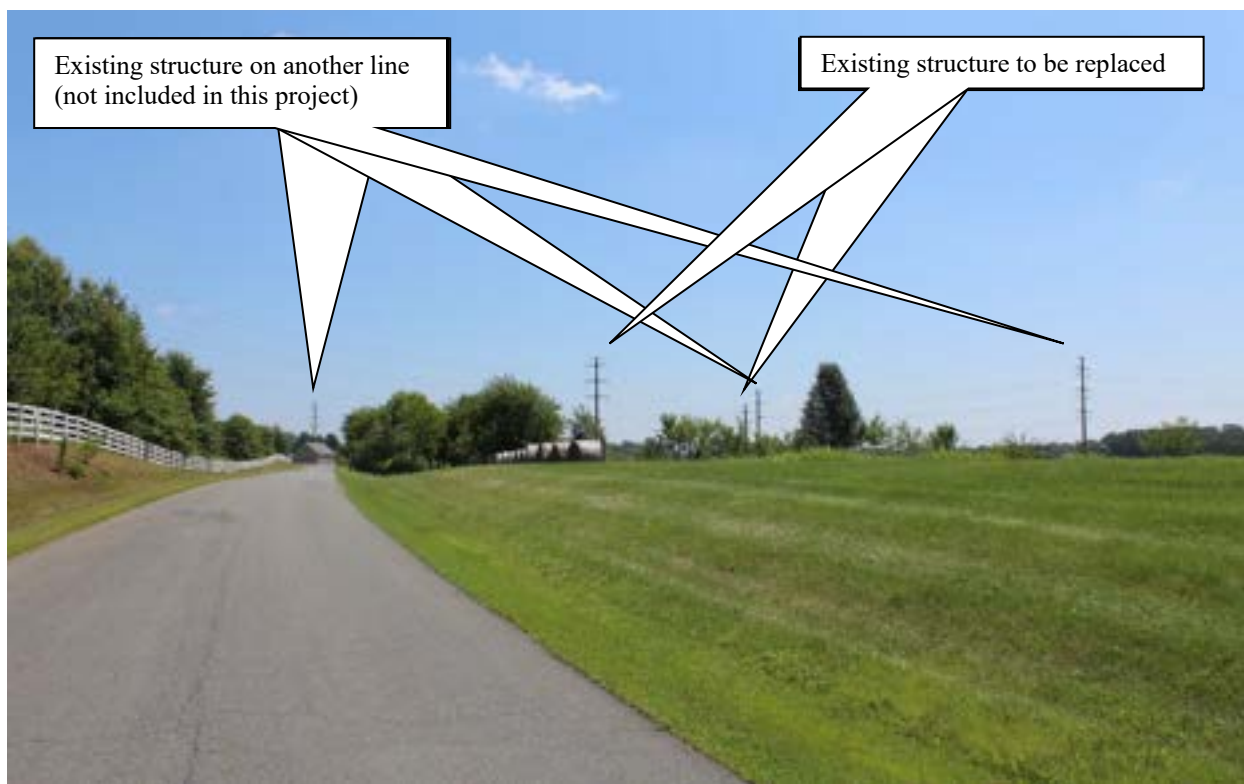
Photo location 8- View from Blackjack Road (Multiple existing project structures and structures on another line visible), facing northeast.
